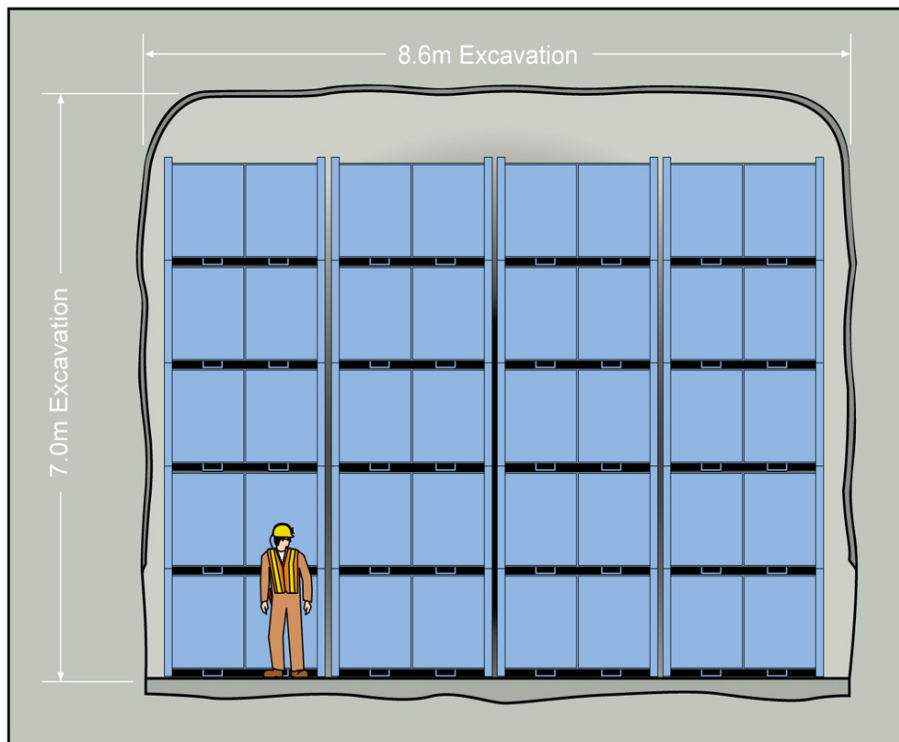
Typical Emplacement Room Configuration for LLW
